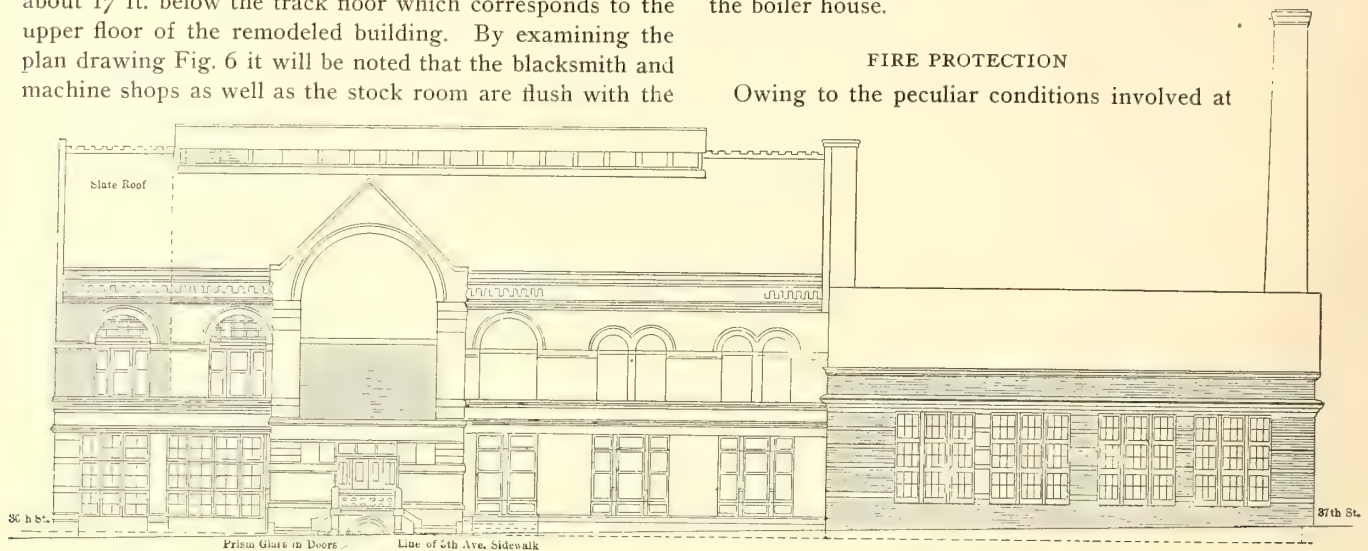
ELEVATION ON FIFTH AVENUE, SHOWING OFFICE BUILDING AND END OF MACHINE SHOP
